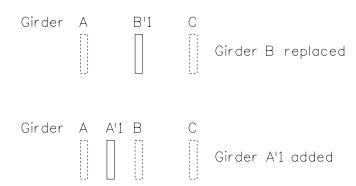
Structure Component Naming Convention for New Girder Added or Replaced
